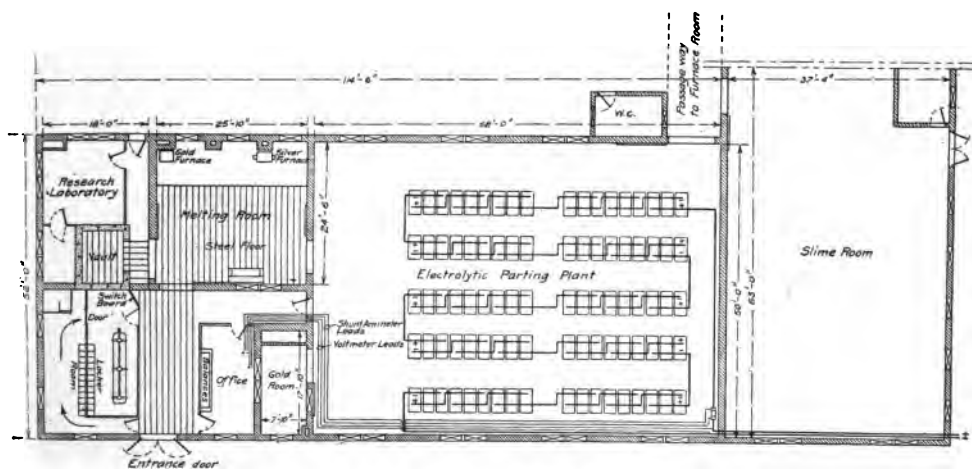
FLOOR PLAN OF PARTING PLANT AND LOCKER ROOM.
